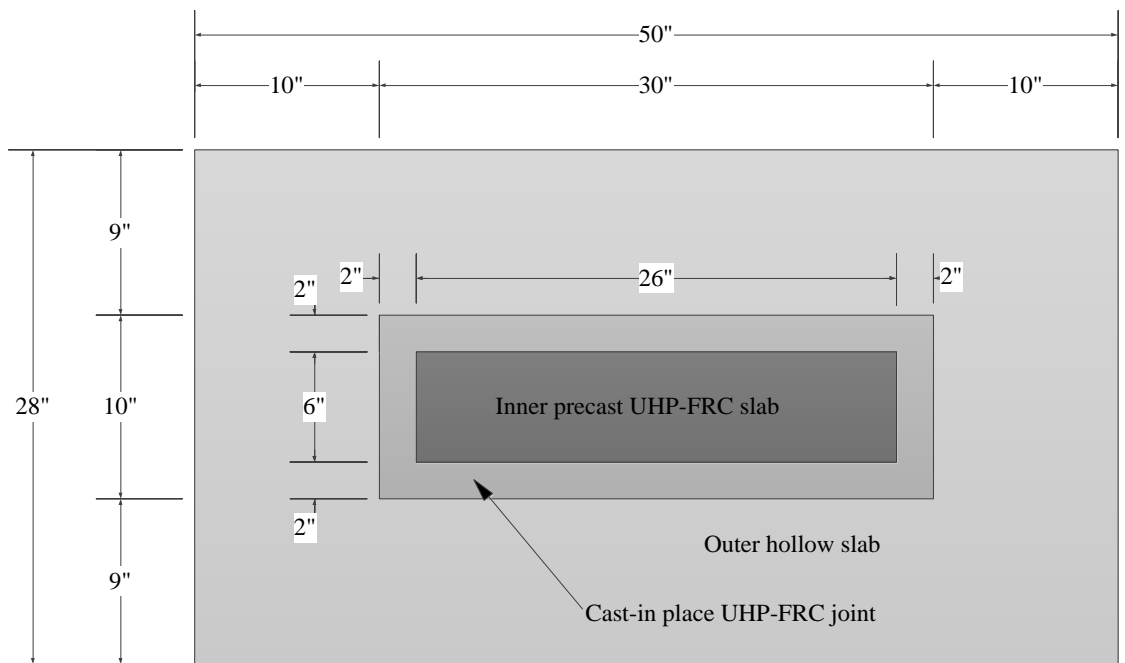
Specimen details for punch test specimen with an inner precast UHP-FRC slab and a cast-in-place UHP-FRC joint.
